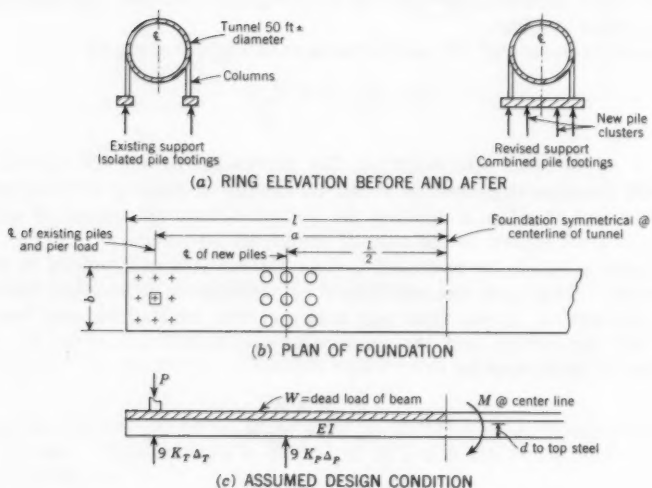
CORNER FOUNDATION ( $C_0$ )
